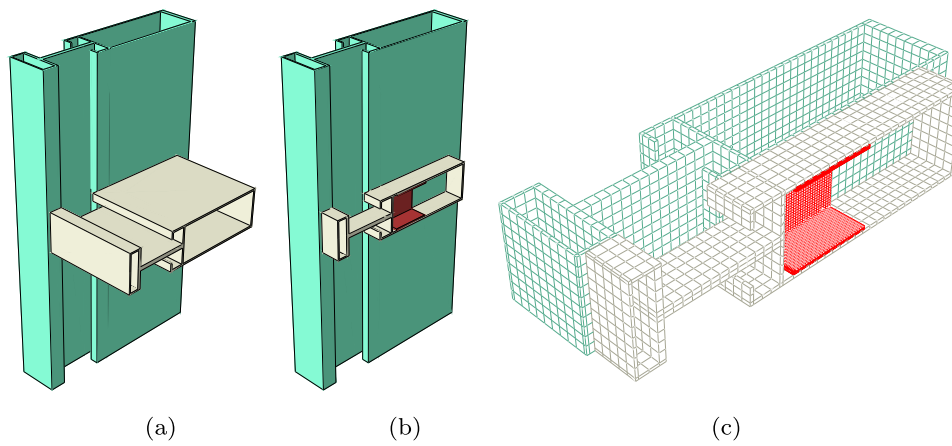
Façade B - Transom-to-mullion connection (a-b) and U-joint mesh (c).
